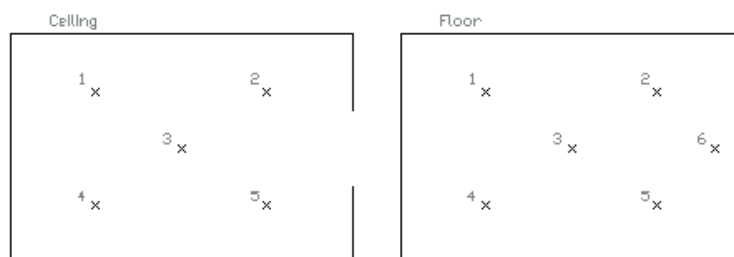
Thermocouple positions (plan view) on ceiling and floor assemblies –Tests #1 - #3
